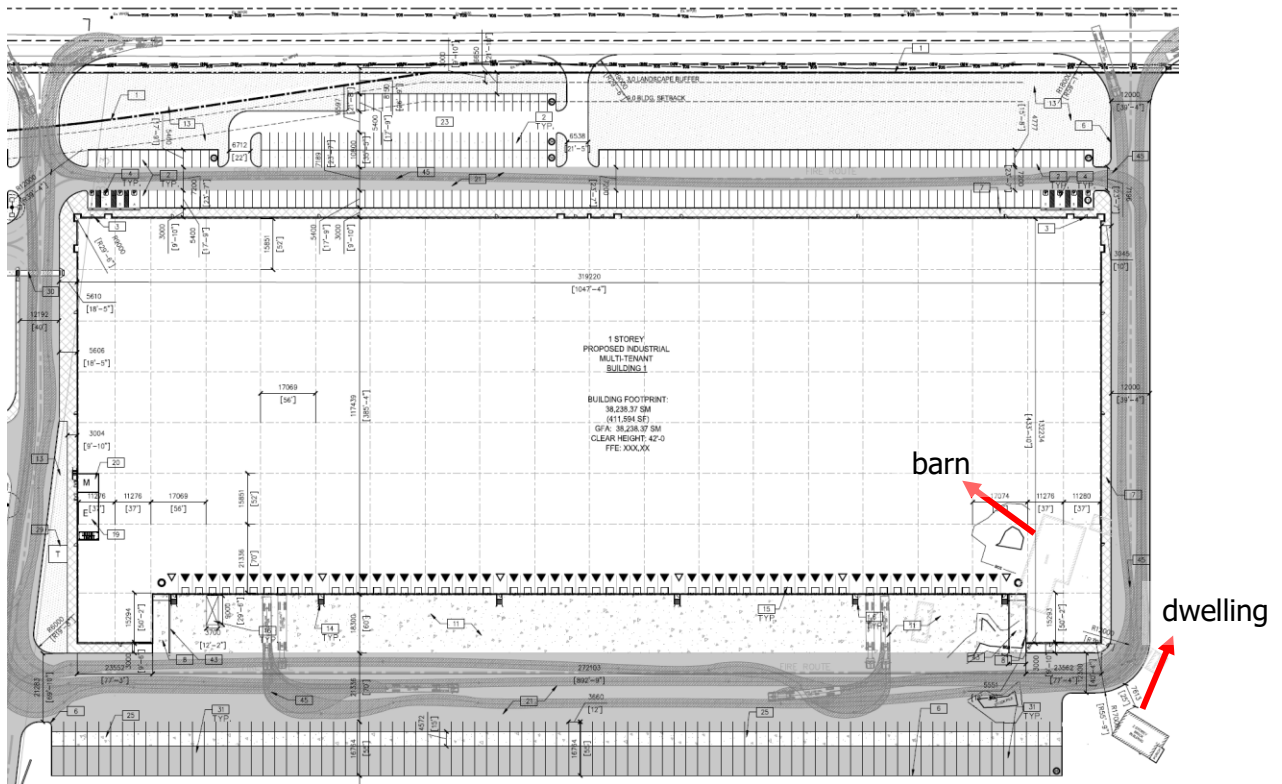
Site plan of the proposed development at 10980 Highway 50, Brampton noting the approximate location of the dwelling and barn (Ware Malcomb, 2024)
